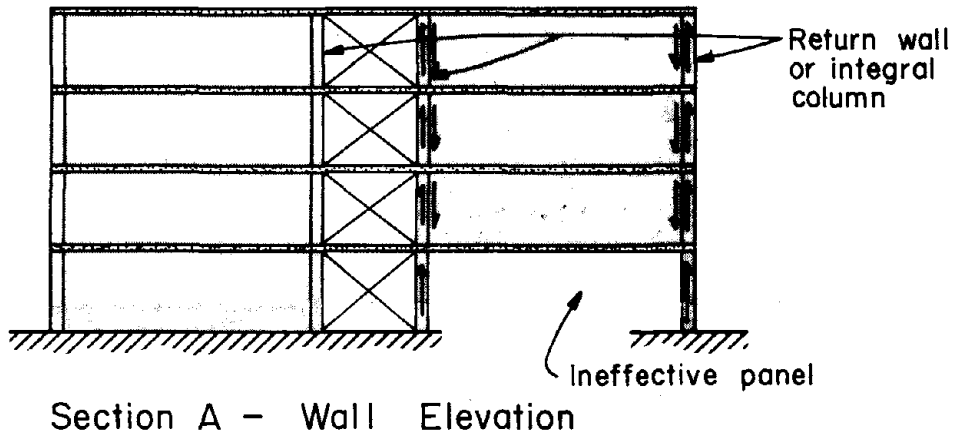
Beam Mode--Single Vertical Wall Panel Stack
